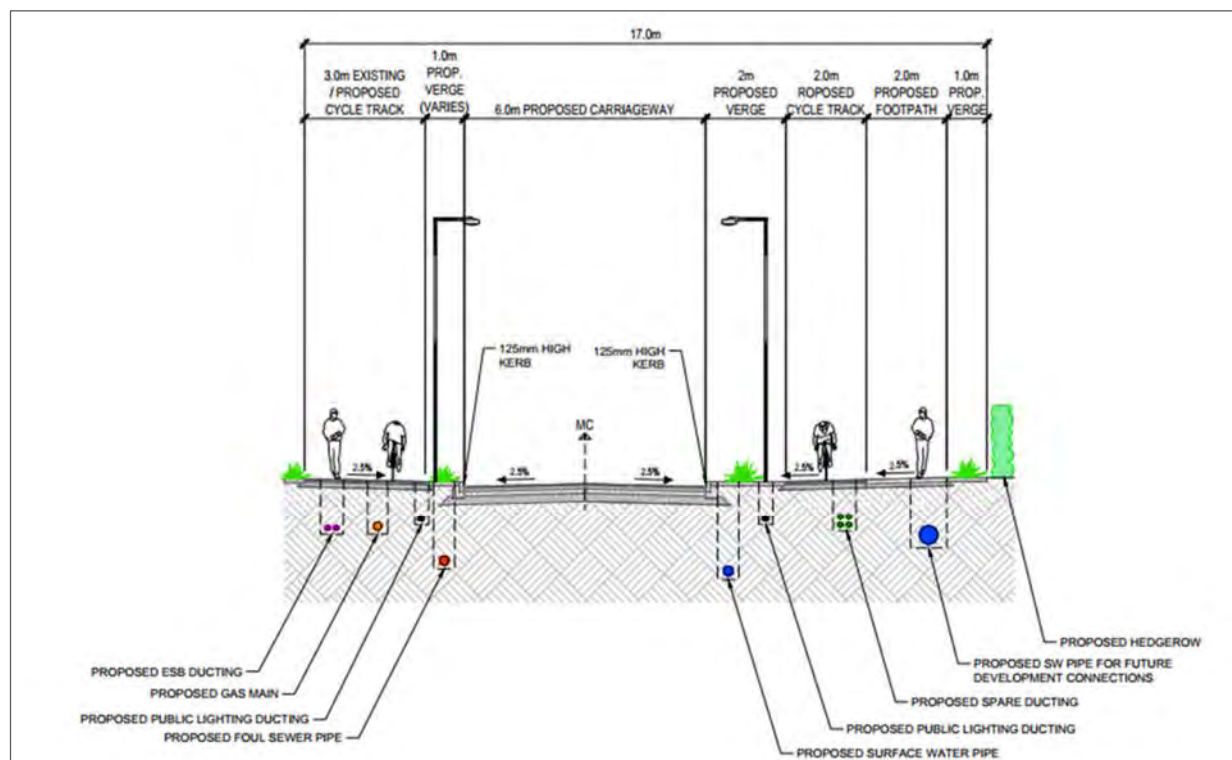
Typical Cross-Section of Wises Road upgrade.
